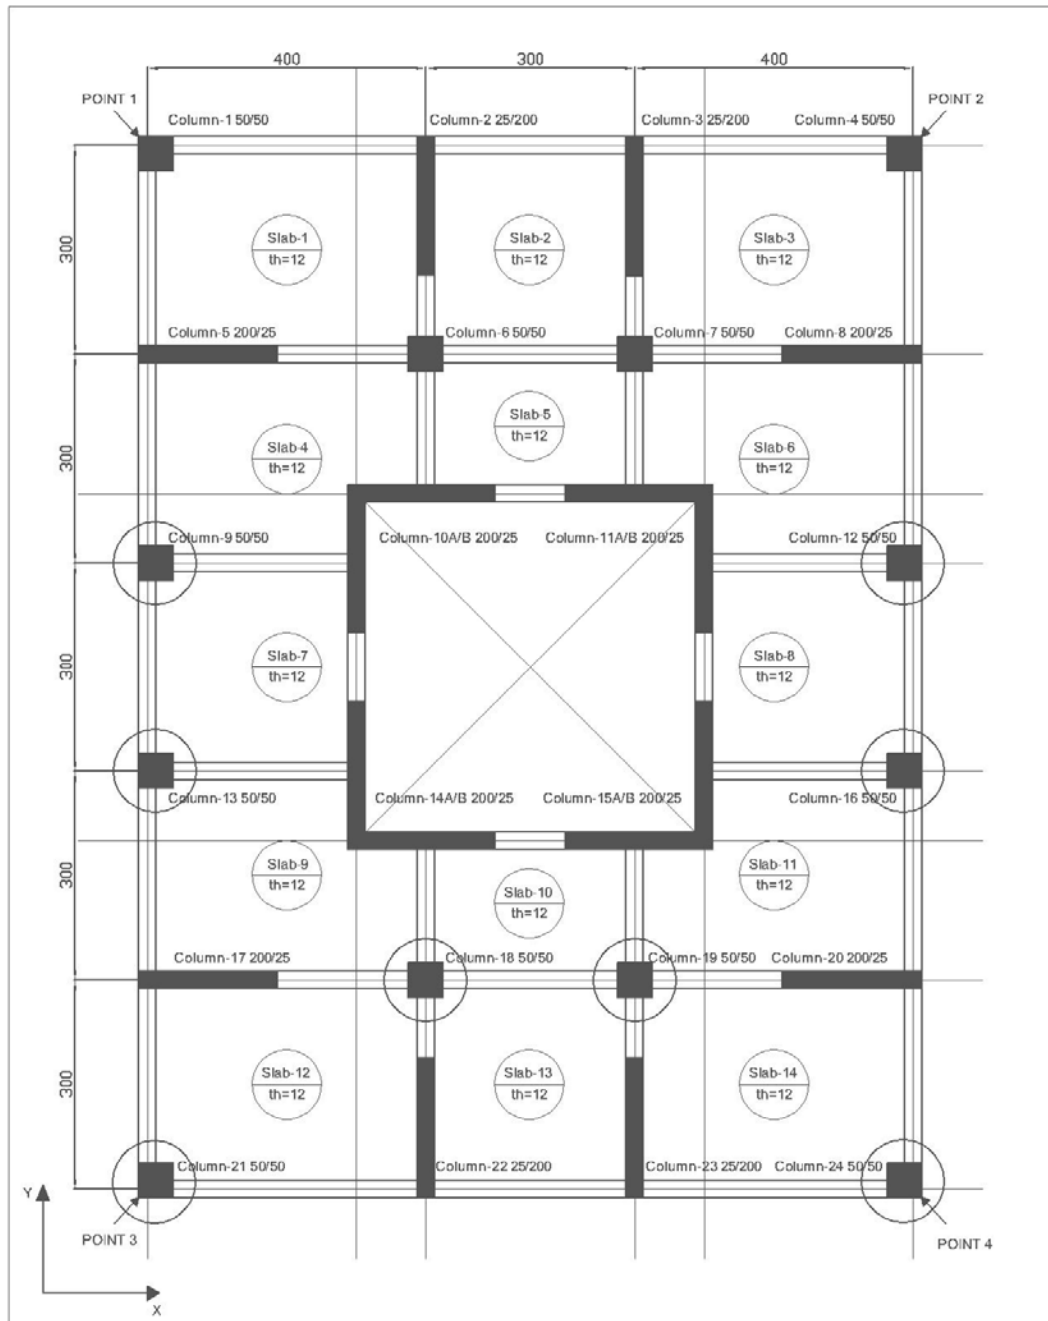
Structural Plan of Idealized Parametric Model-D
